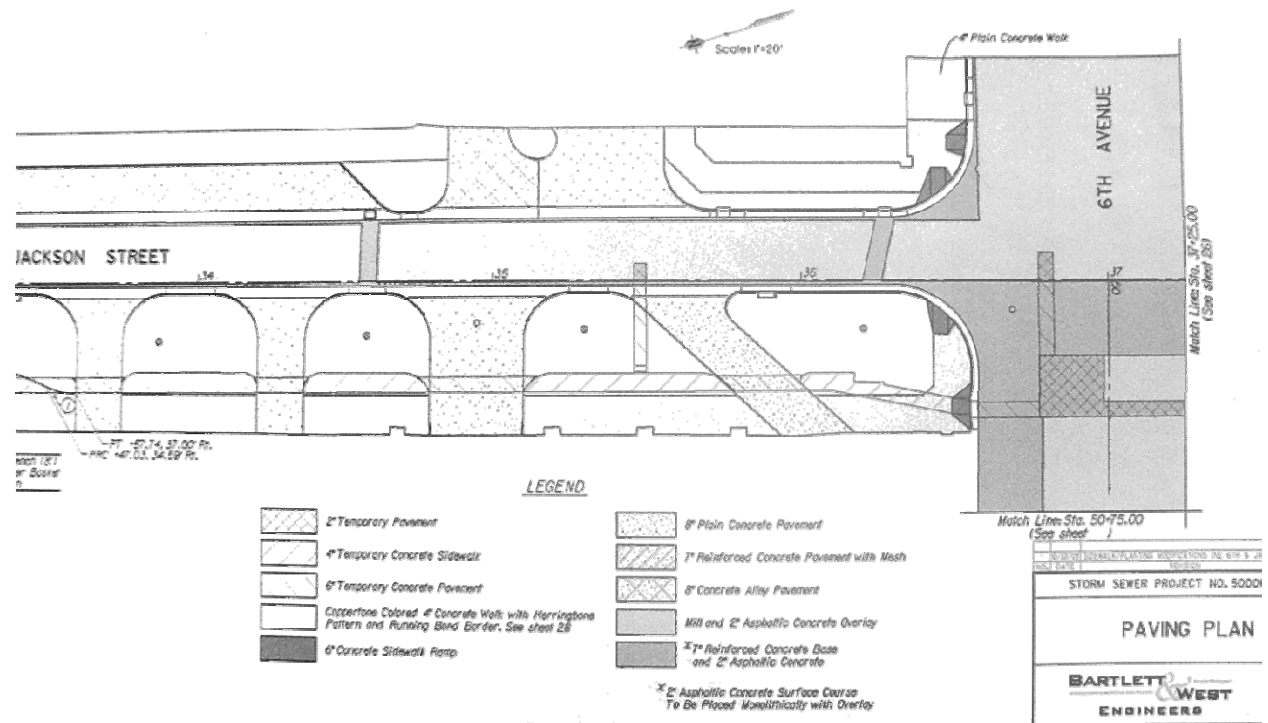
Paving Plan (Bartlett and West Engineers, 2003)
